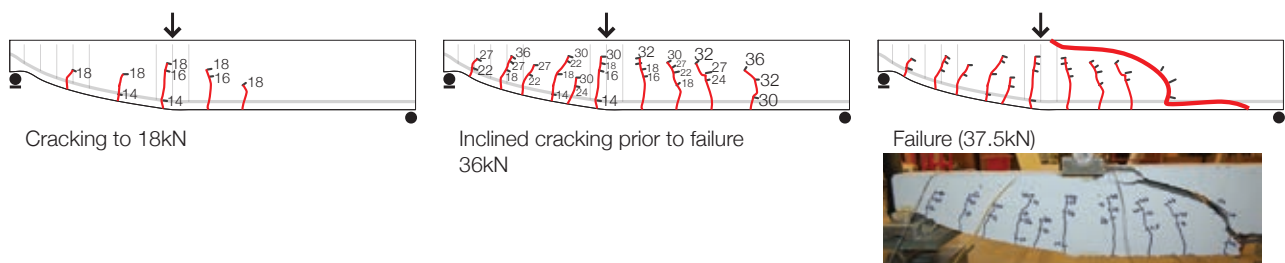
Setup and Progression of cracking in Beam 9\_2\_CFP\_V(i).
